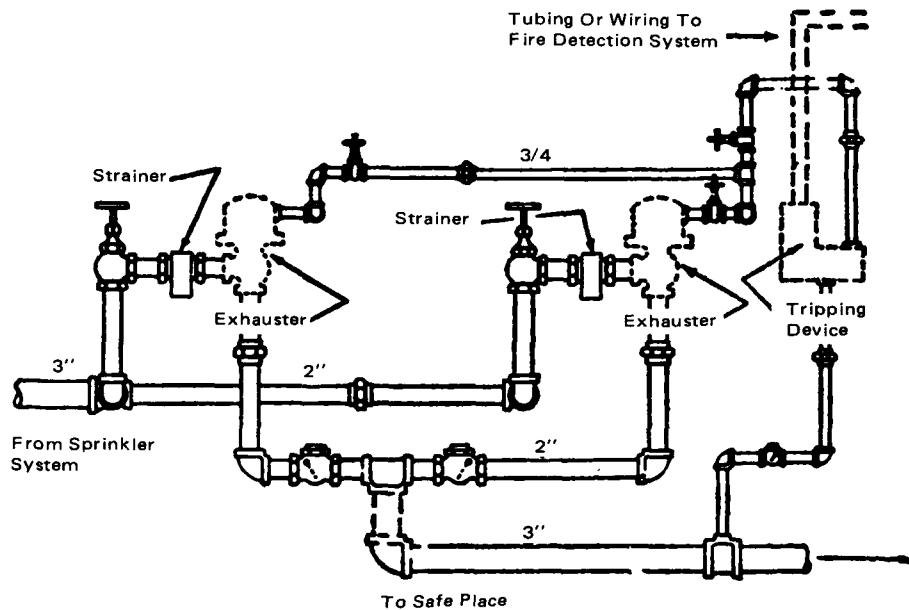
Arrangement of air exhaust valves for combined dry pipe and preaction sprinkler system.
